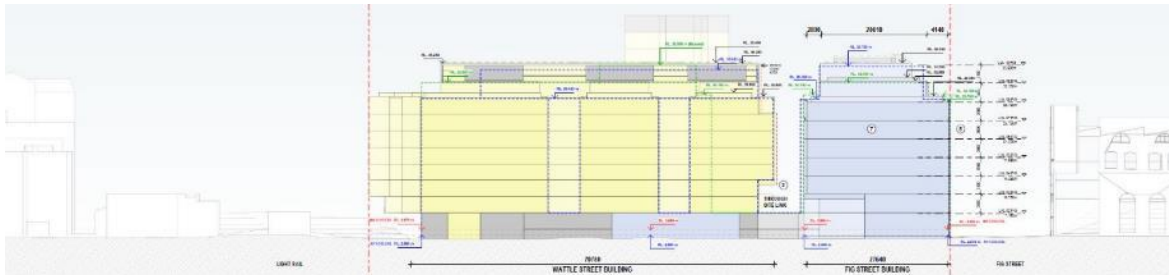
Envelope plans: Approved and proposed Wattle Street Elevation
